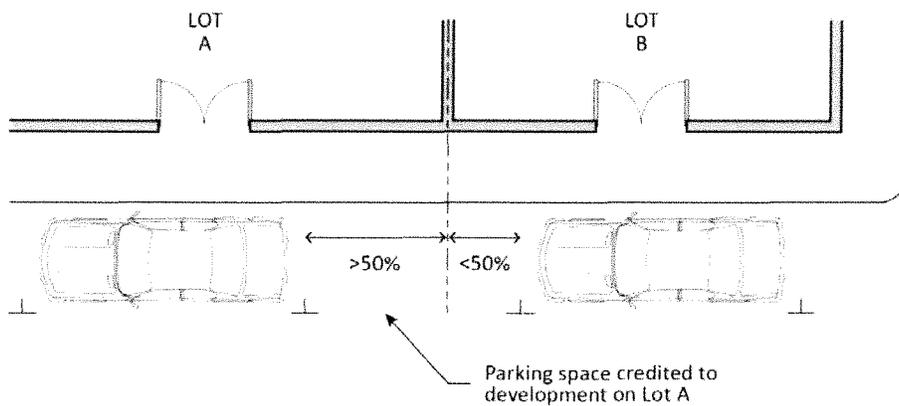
D.1.A: ON-STREET PARKING CREDIT
